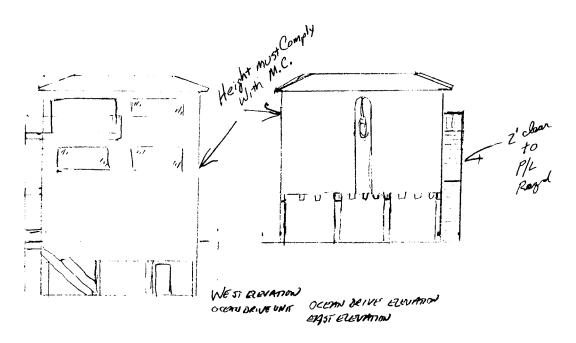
Sketch/copy of redlined east/west elevation views of 3405 Ocean Drive from 1973 Plans with notes "Height must Comply With M.C." and "2' clear to P/L Reqd".
